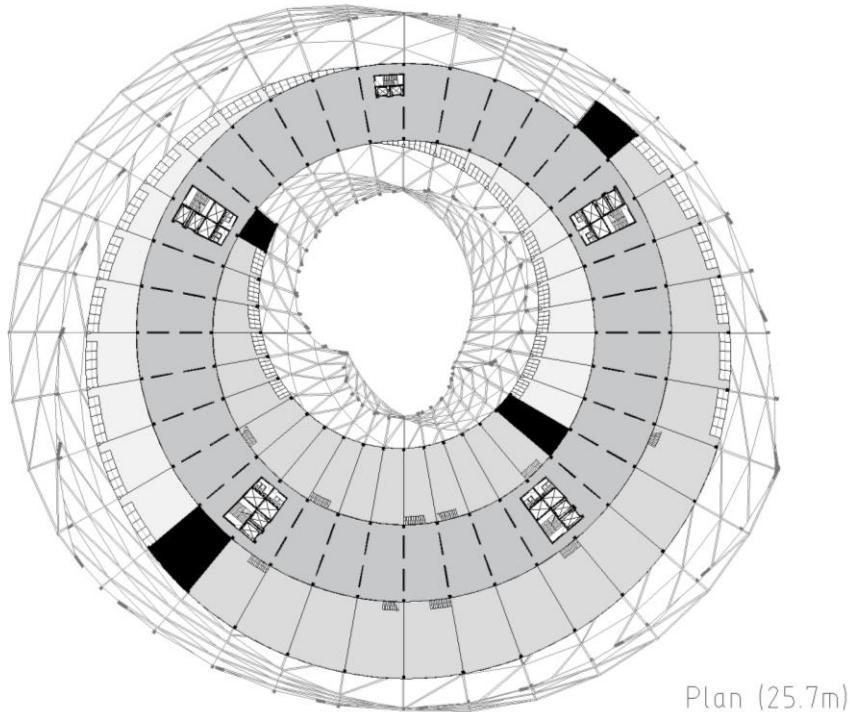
Building plan at 27,5m (3rd library floor)
